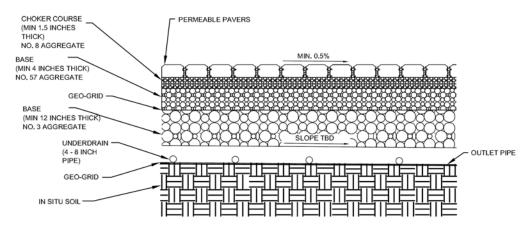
C. Permeable Pavers with Underdrain System (Profile View)
